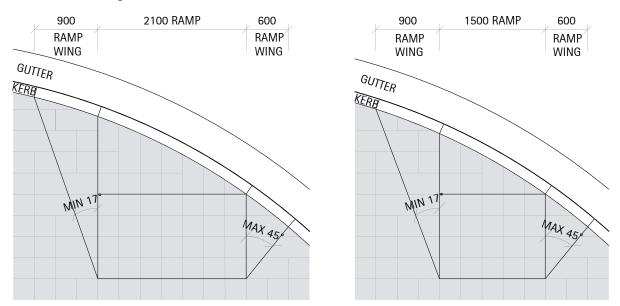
Ramp Wings when Ramp Not Aligned to Face of Kerb
